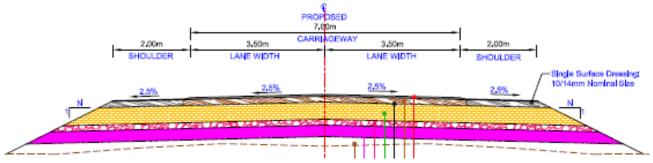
Single carriage cross-section until 2030 (proposed by detailed design)
